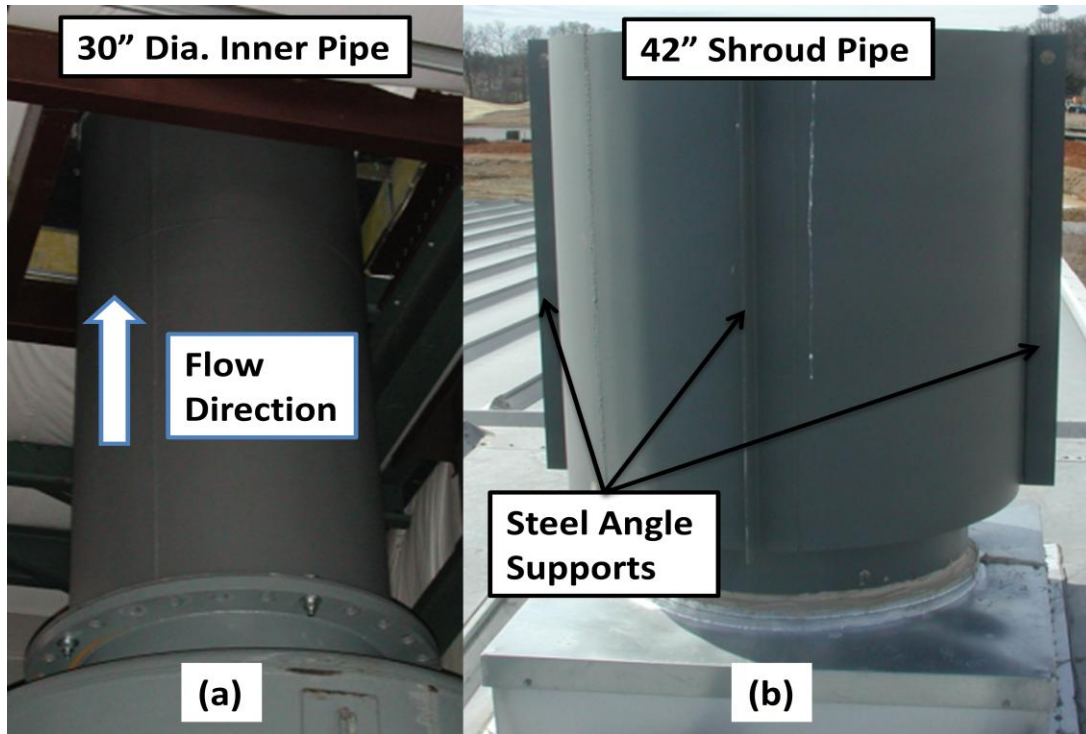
(a) 30" diameter inner exhaust pipe exiting through facility roof. (b) 42" diameter shroud pipe on top of facility roof, steel angle supports welded to shroud pipe can be seen.
